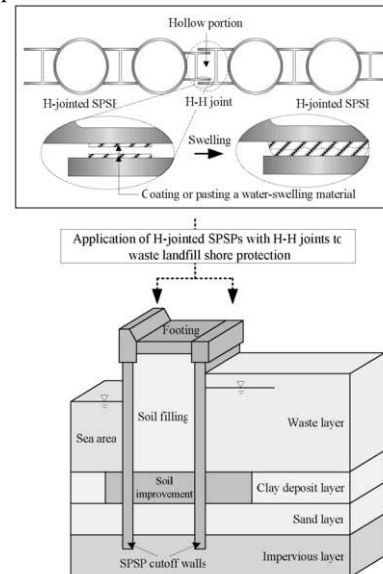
General application of H-jointed SPSP with H-H joints to waste landfill shore protection (Inazumi and Kimura)
